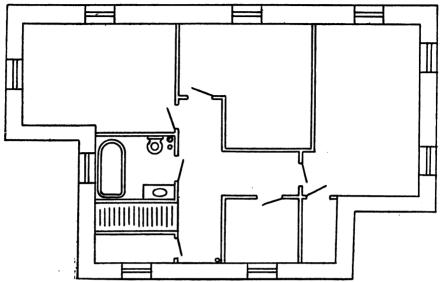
Showing Bathroom Connections on Second Floor. Scale 1/8.inch to 1 foot.
